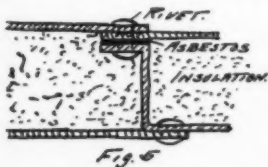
shows a further improvement, a sheet of asbestos being placed between the steel sheets as shown in Figure 2. The contact between the inner sheet lap and the outer sheet being broken, there exists
